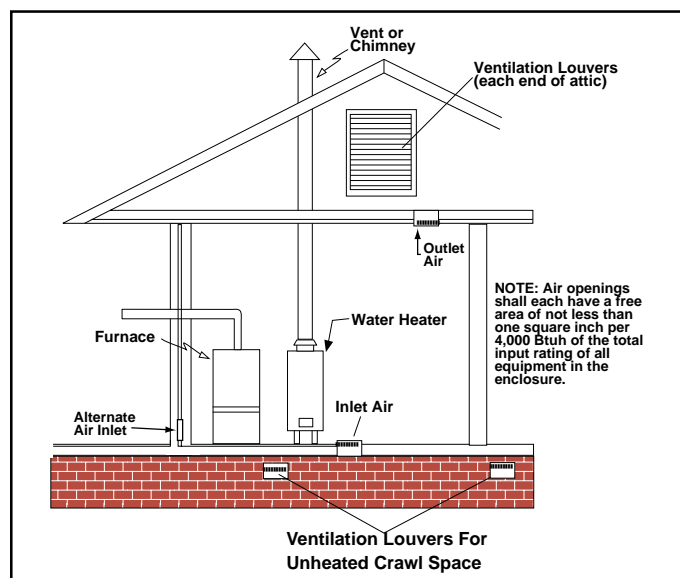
Equipment in a Confined Space with all Air Drawn from Outdoors - Through Ventilated Crawl Space and Ventilated Attic
